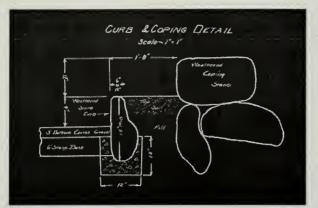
Granite curb detail from the parking lot at the end of Schoodic Point Road. (U.S. Department of Agriculture, Bureau of Public Roads, Project 2A2, Sheet 2,1933-1934)
